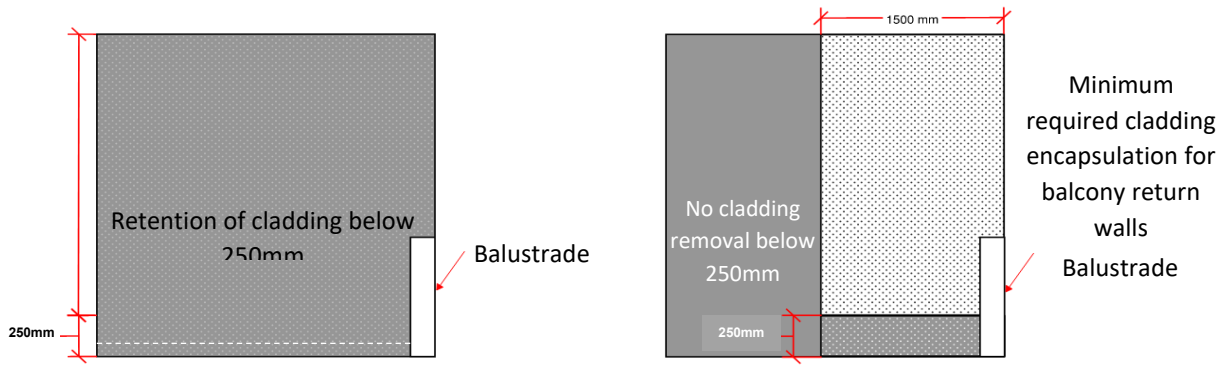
Elevation of balcony return wall cladding encapsulation (left) and cladding removal (right)
